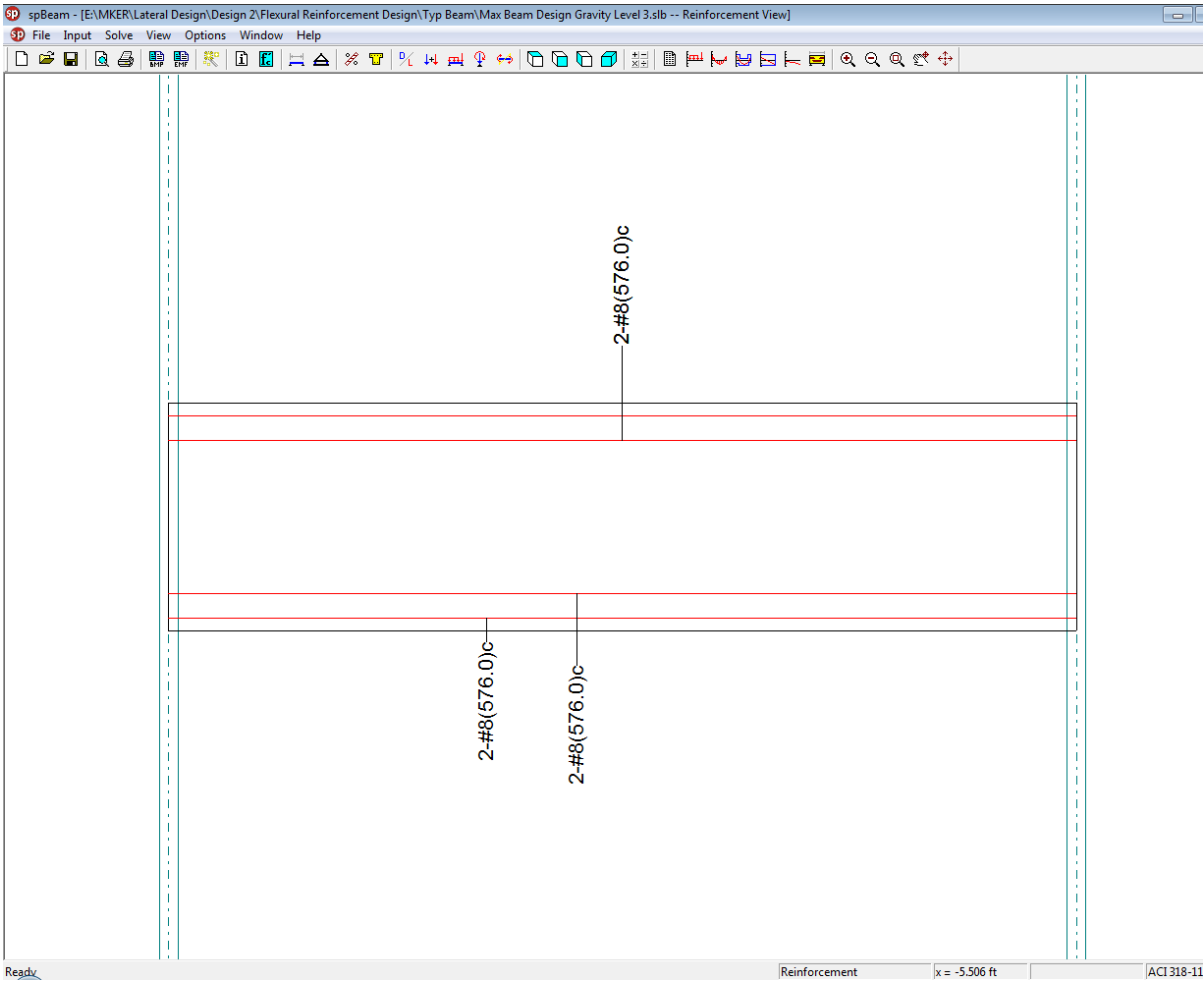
, spBeam Flexural Reinforcement Design of BG at Lvl. 3
